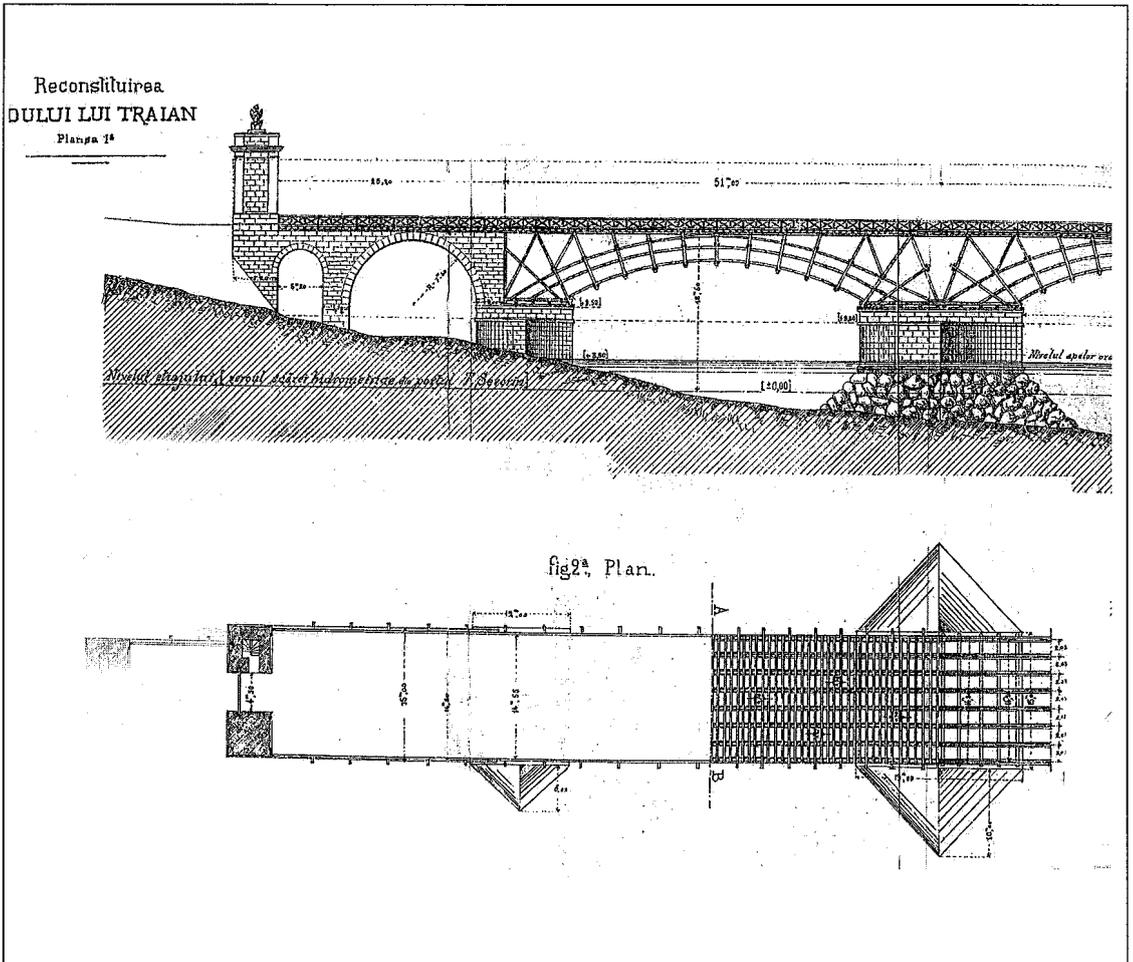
Duperrex's sketch of the end of bridge plan and profile.
